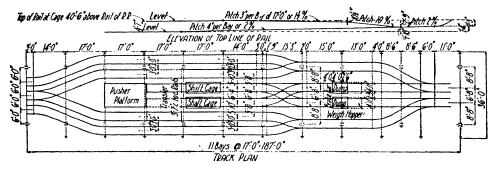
PLAN OF TIPPLE TRACKS, SPRING VALLEY NO. 5 COAL TIPPLE.
